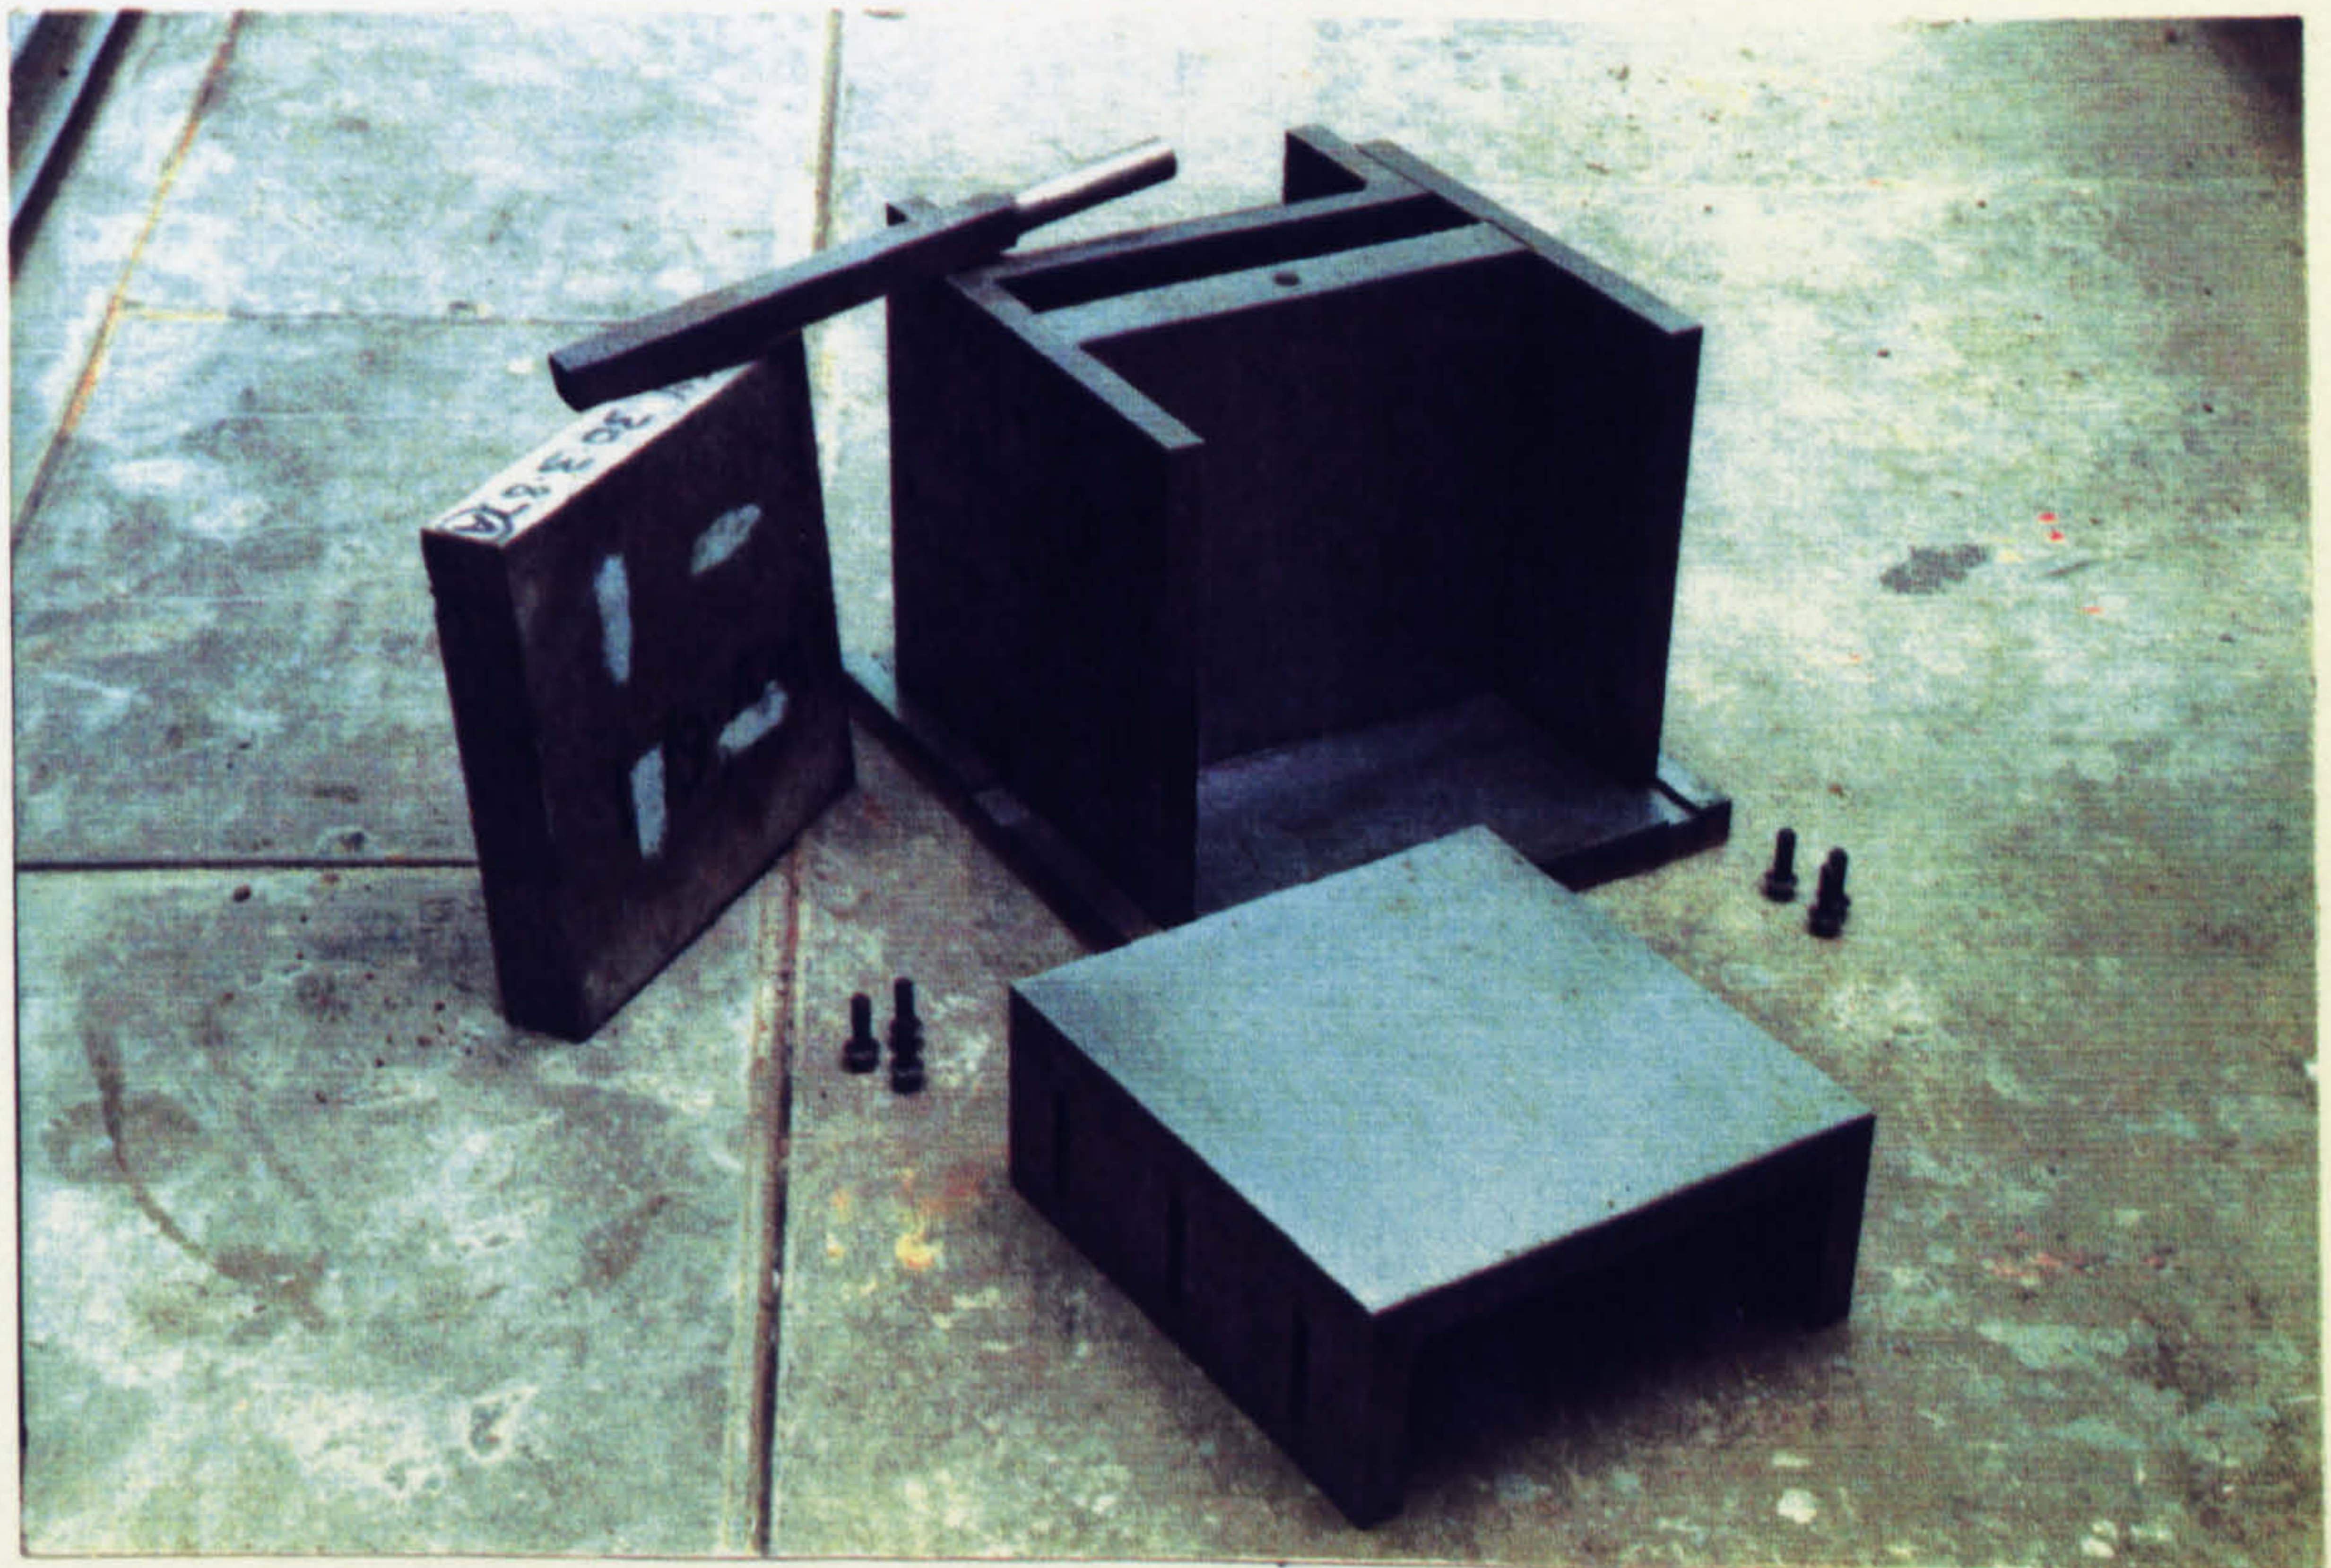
Photograph of steel mould, square head rammer (used to compact the concrete slabs) and a typical concrete slab.
